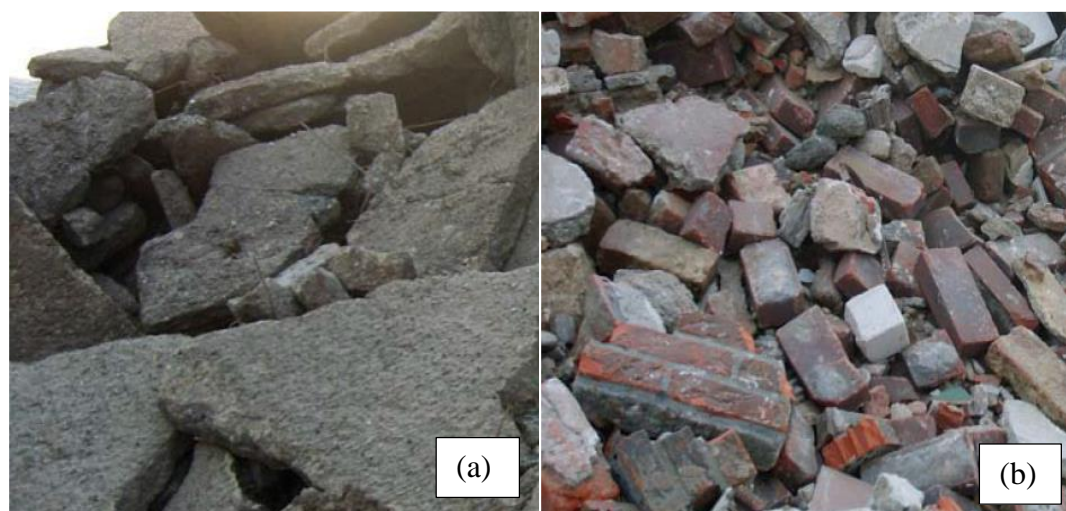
Construction and Demolition Waste (a) Concrete rubble (b) Masonry rubble
